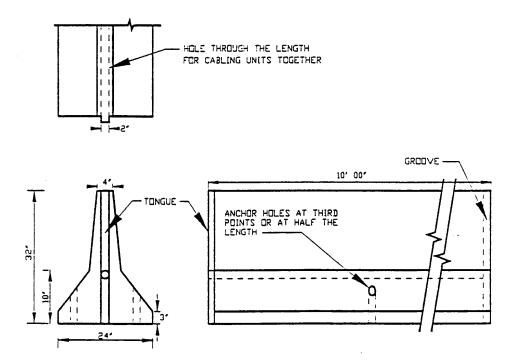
JERSEY HIGHWAY BARRIERS - SINGLE UNIT
